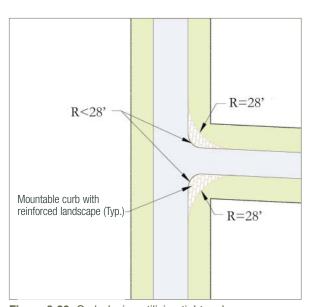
Curb design utilizing tight curb radii reduces pavement and calms traffic
